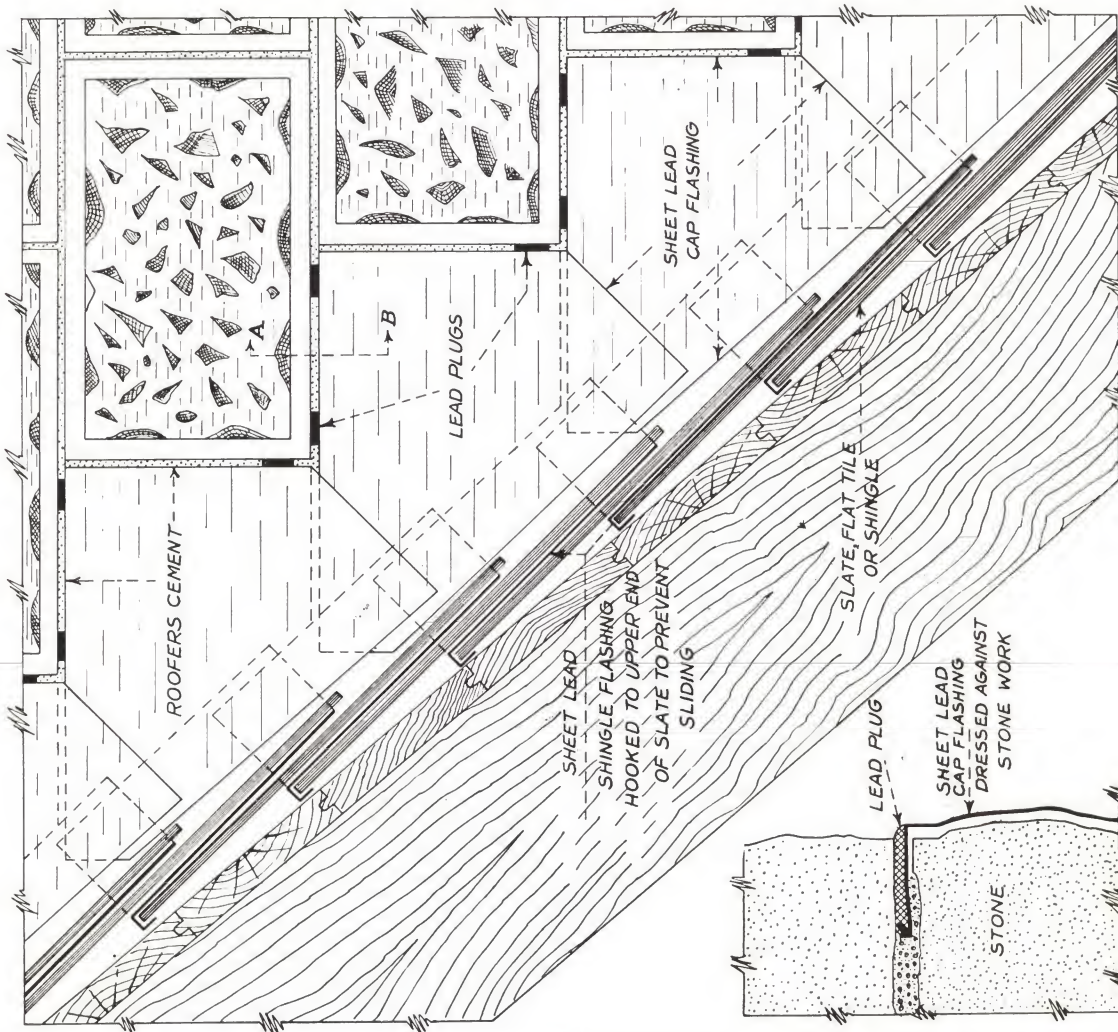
SECTIONAL VIEW SHOWING APPLICATION OF SHEET LEAD FLASHINGS AGAINST ROUGH STONE CHIMNEY - SCALE 2"=1'-0"
